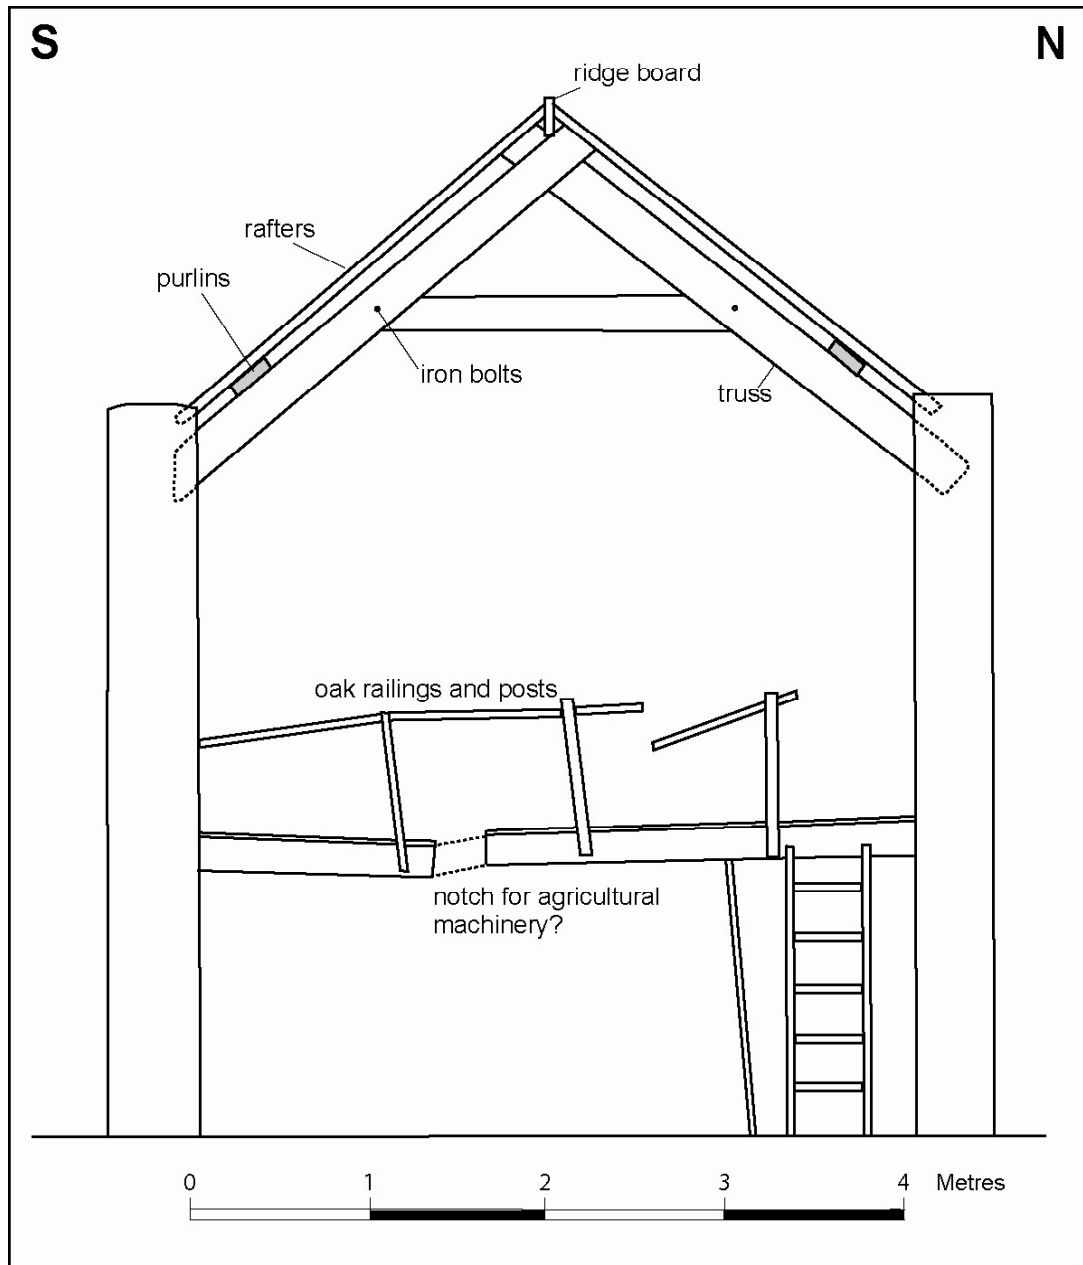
Cross-section of the roof structure and internal 'floor' of the barn (scale 1:20 @ A4).
